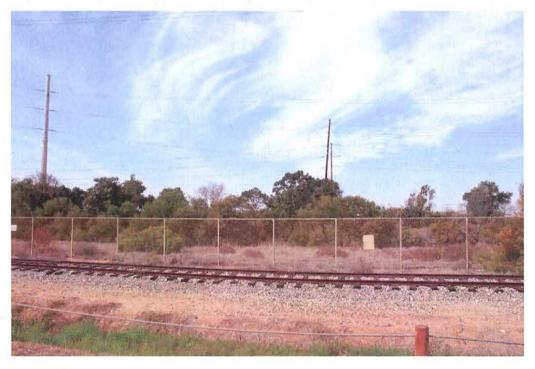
Existing view toward the proposed substation site looking north-northwest from the west side of Bay Boulevard and the bike path (north of Palomar Street)
